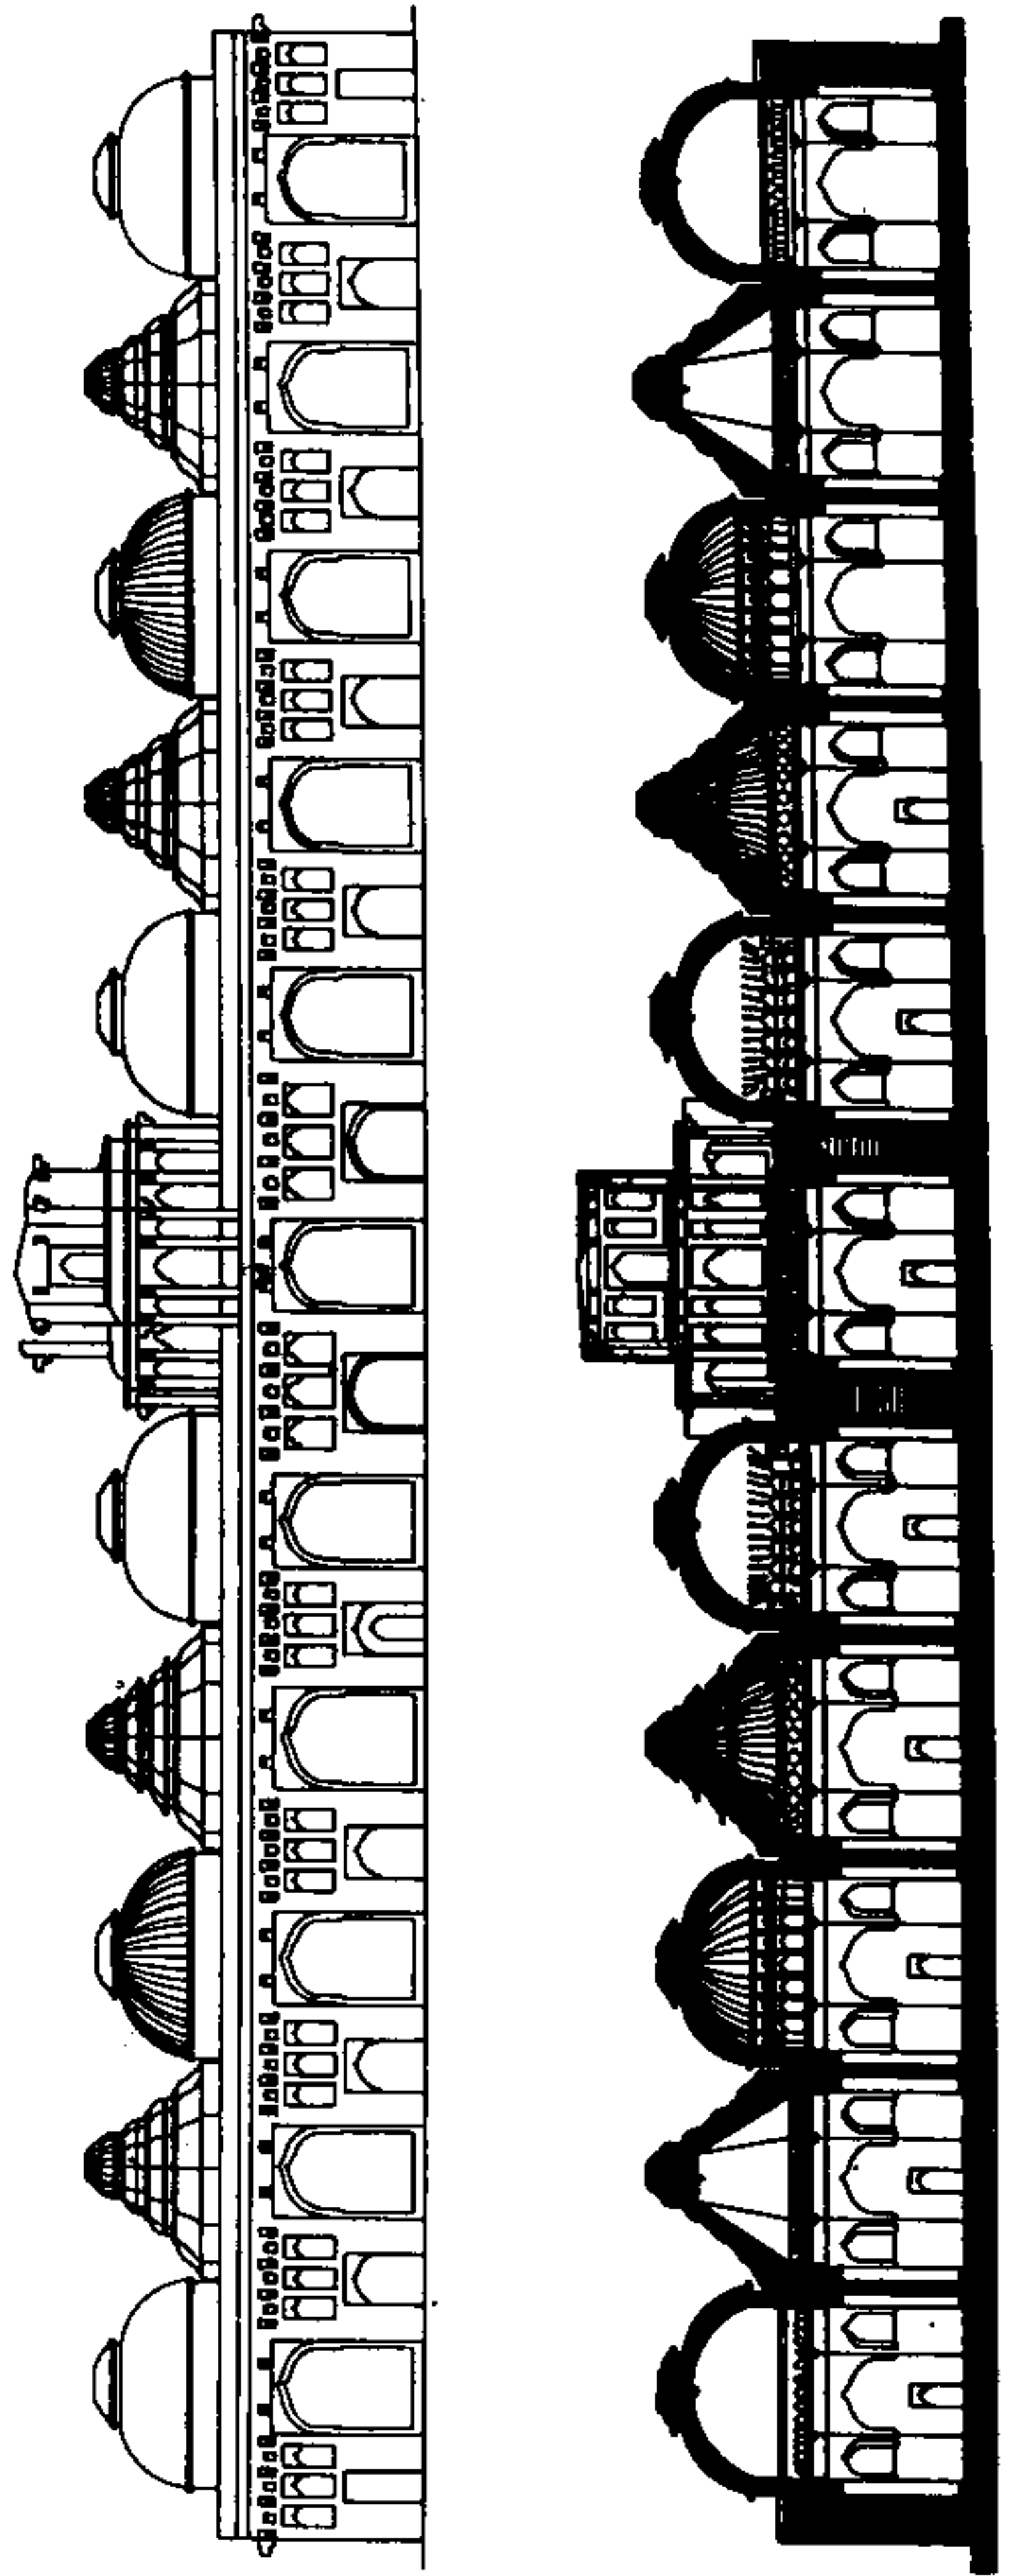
Vijayanagara: Elephant stables, elevation and section.
